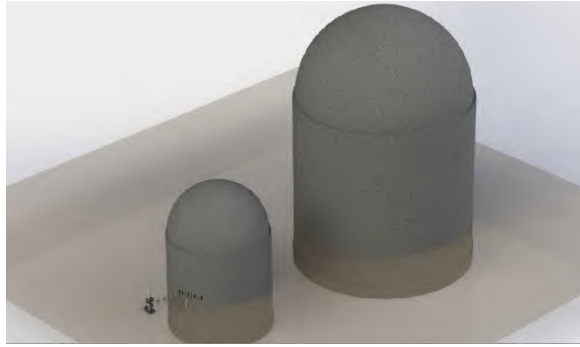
Example of a prototype and scaled down model from where a “test specimen” is extracted for laboratory testing.
